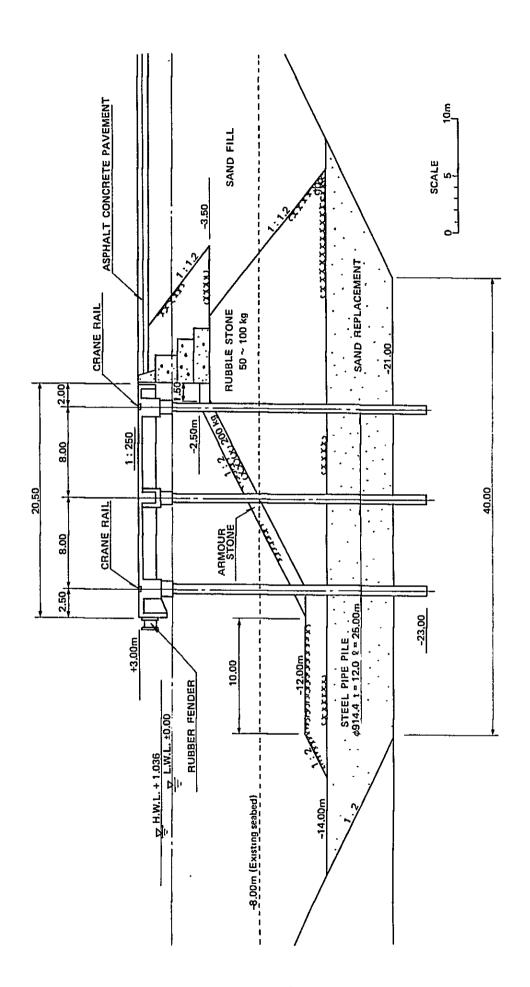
Container Berth Piled Wharf (Steel Pipe Pile Supported Platform)
